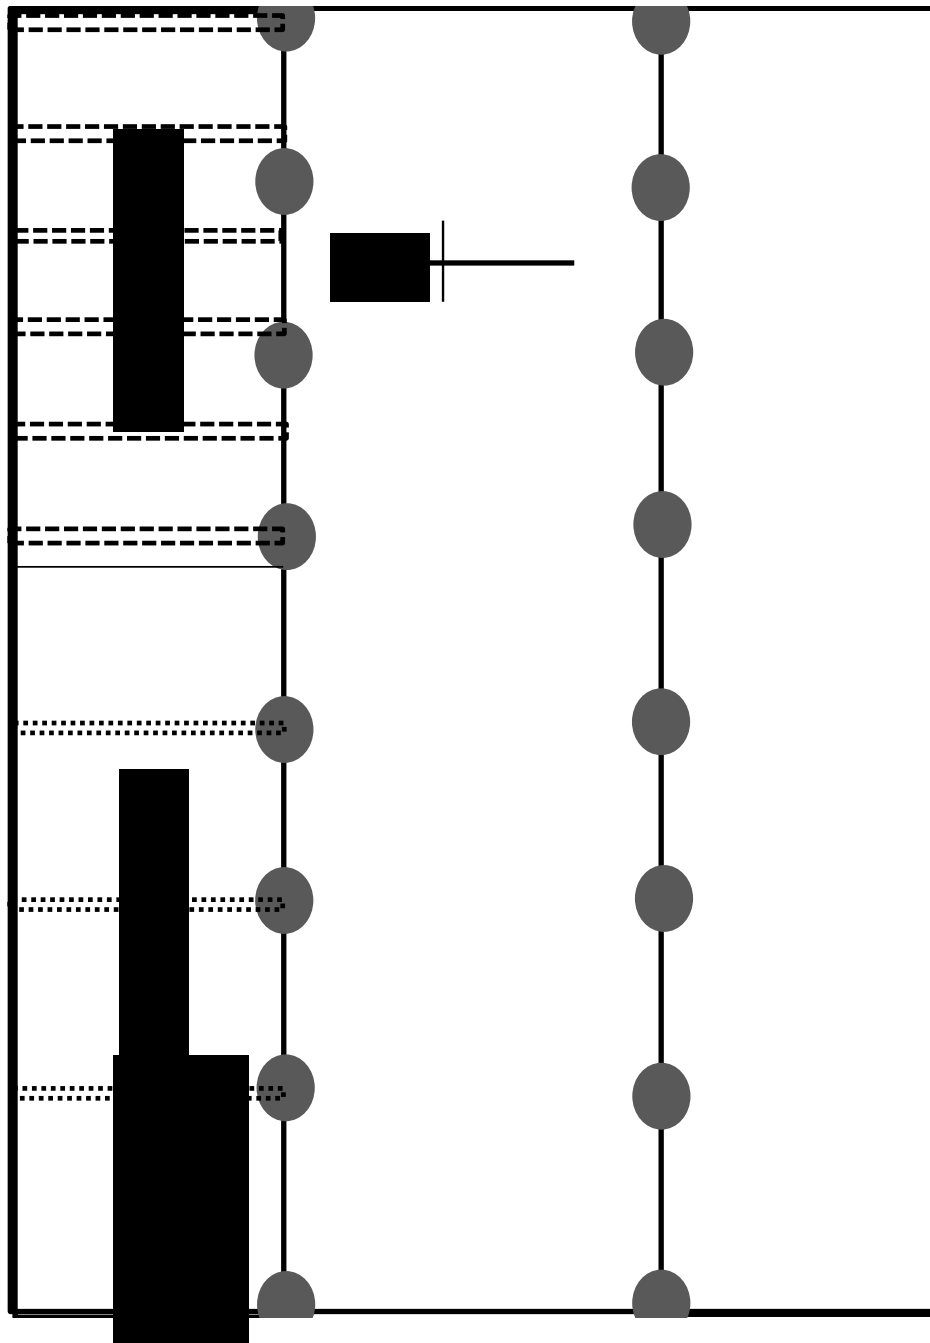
Highly simplified ground floor plan of All Saints Church to show position and arrangement of the north aisle roofs
